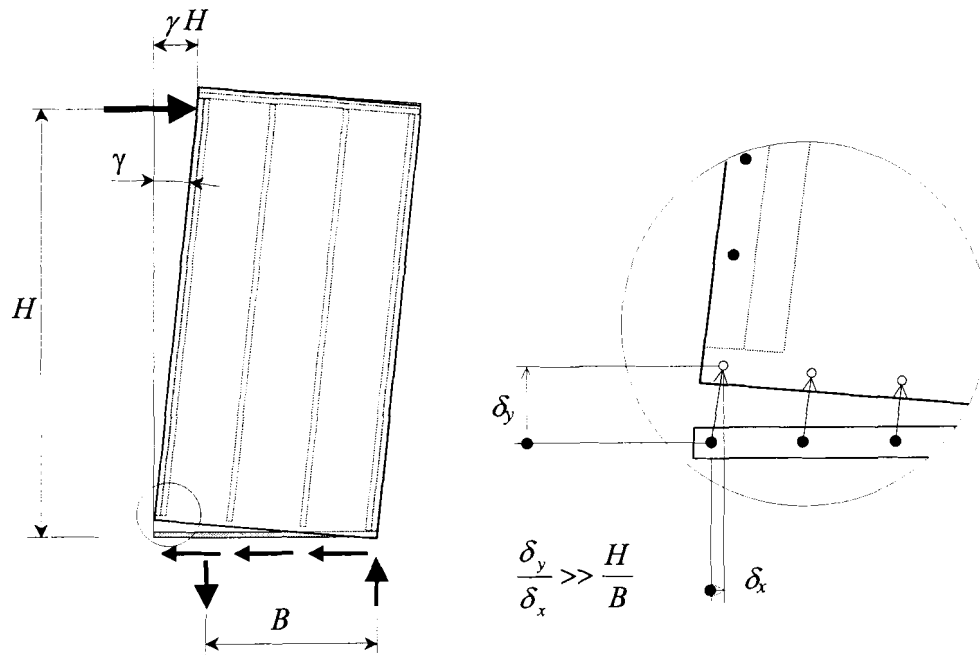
Deformation of non-anchored shear wall (Salenikovich 2000).
